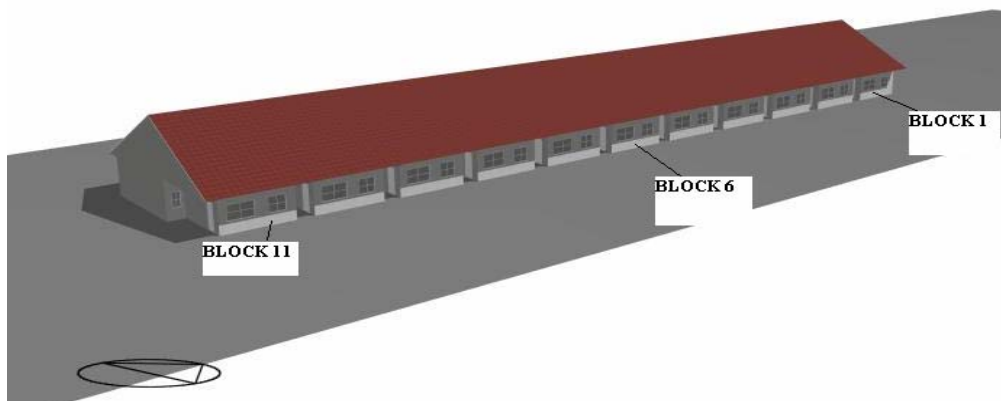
Visualization of the Terrace House Array with North Point in DesignBuilder.
